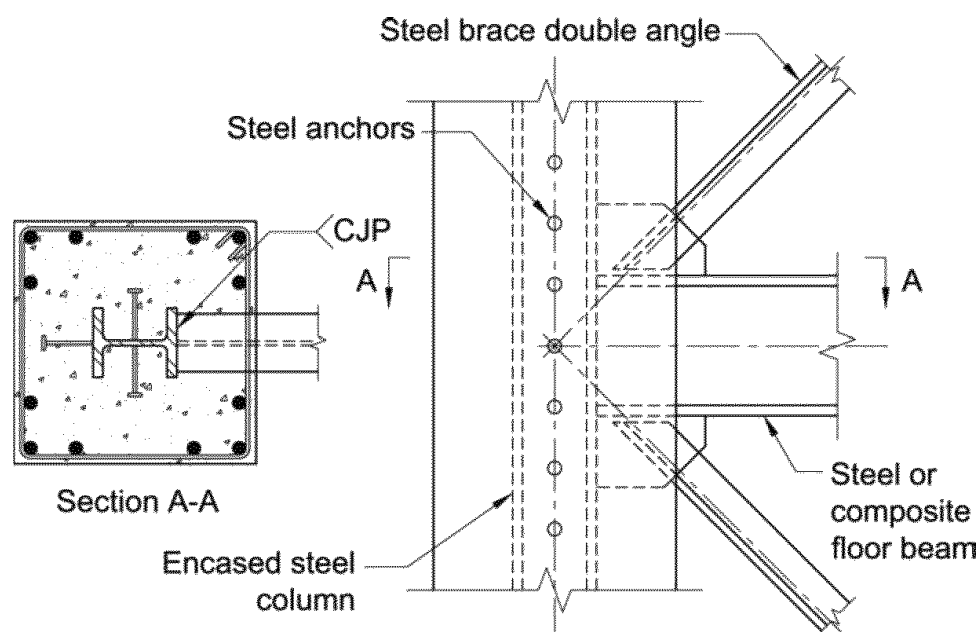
Reinforced concrete (or composite) column-to-steel concentric brace.
